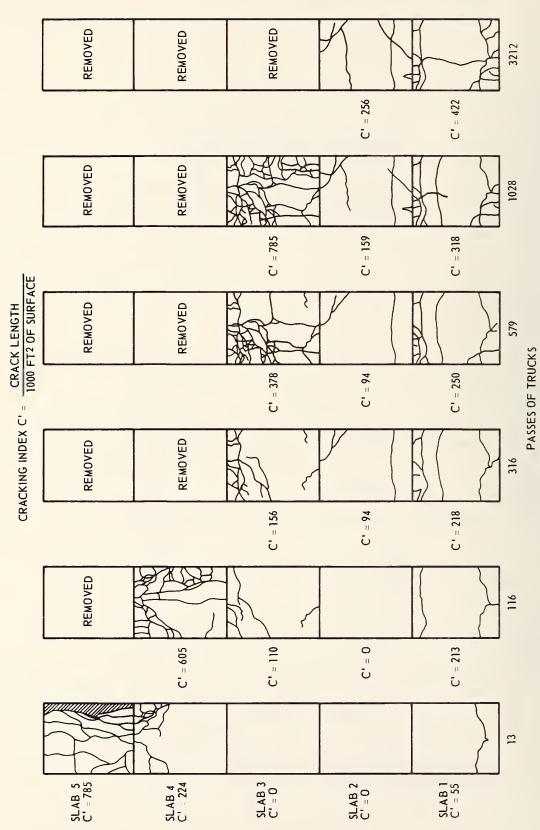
Crack development in glass fiber reinforced concrete slabs under 85 kip single axle test \log^{79}
